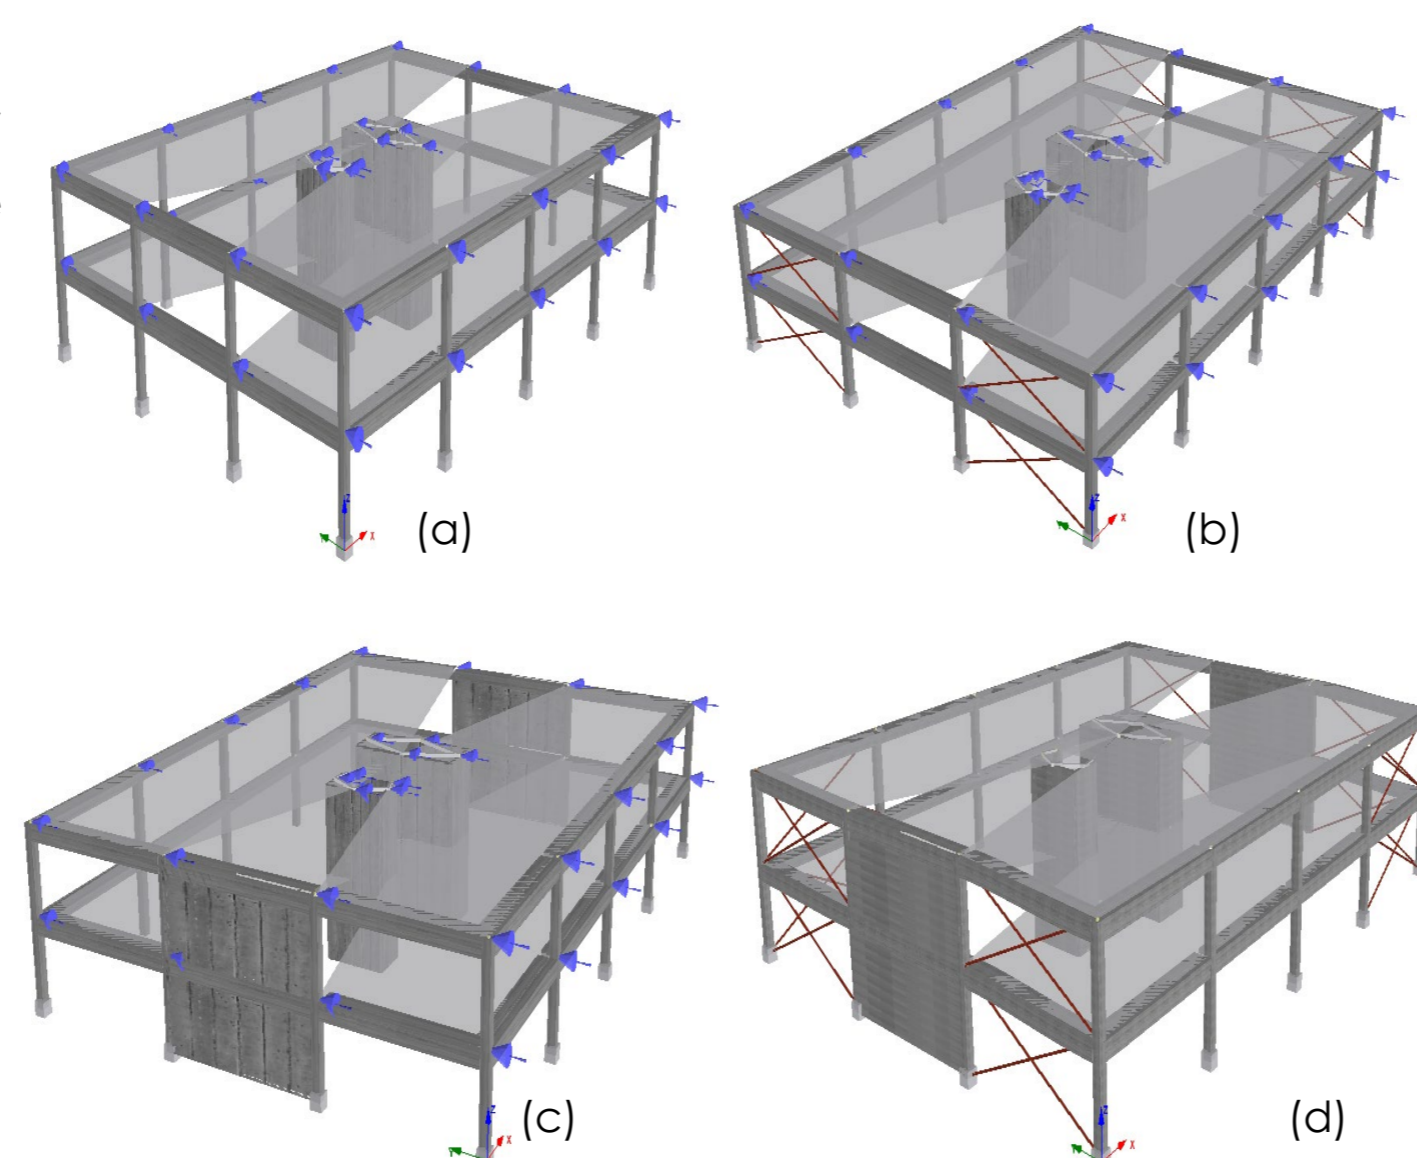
Building models with pushover loads assigned (a) unstrengthened (b) bracing retrofit (c) wall retrofit (d) wall and bracing retrofit
